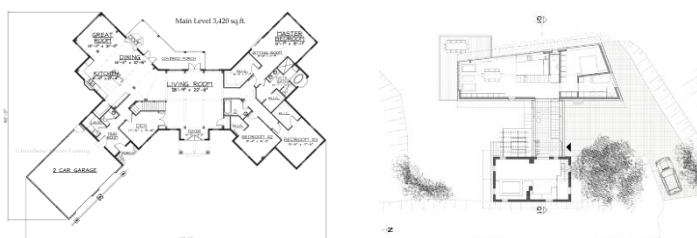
Edgewood design - Riverbend Timber framing (<http://www.riverbendtf.com/floorplans/edgewood.html>); Fig. 314 - Haus am Steinberg / HoG Architektur (<http://www.archdaily.com/325329/haus-am-steinberg-hog-architektur/>).
